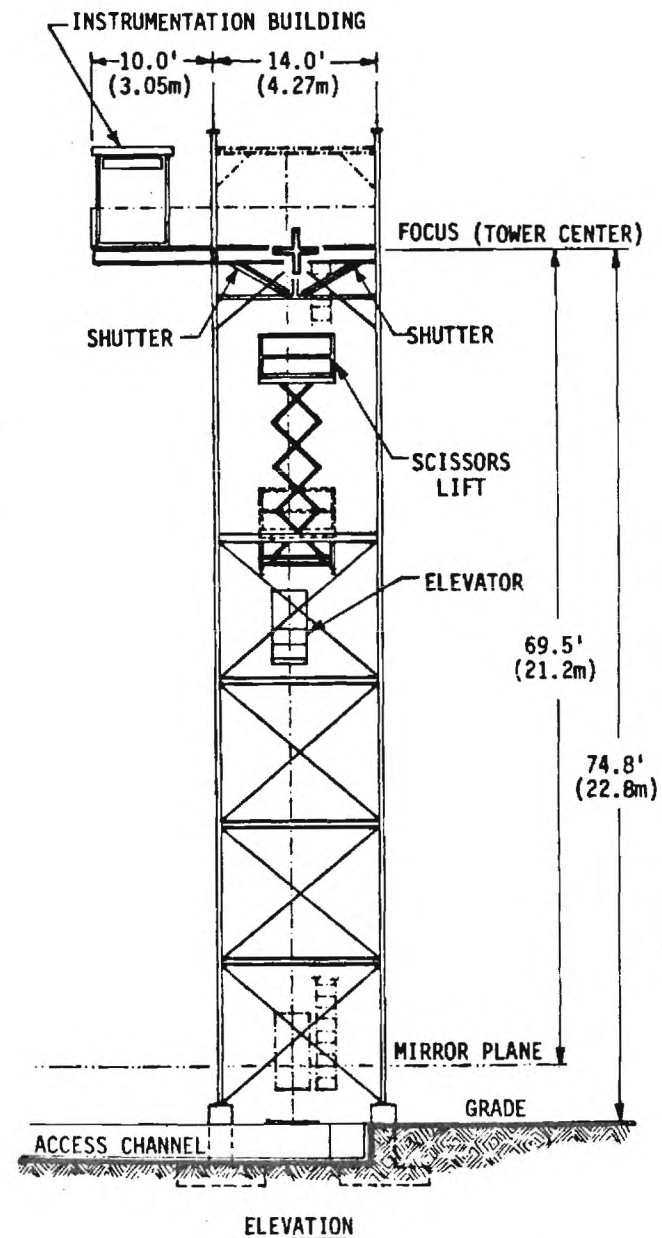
ACTF Test Tower and LBL Test Article on Tower.
